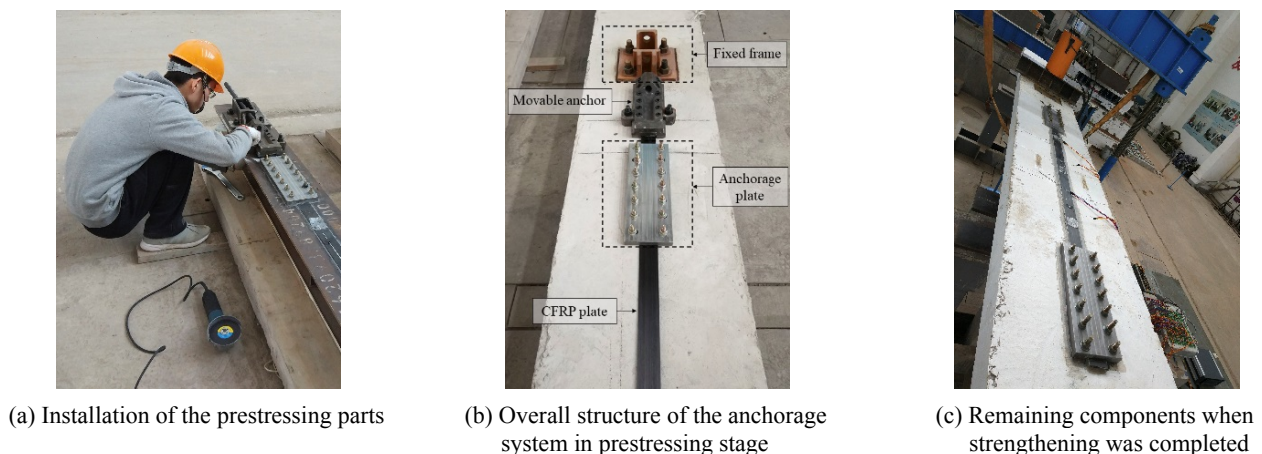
Anchorage systems for strengthening with prestressed FRP laminates
